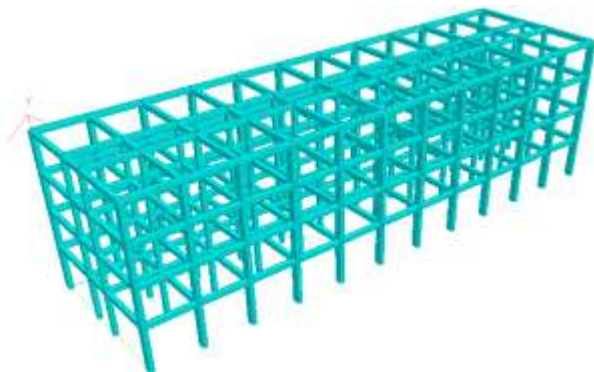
3D rendering view of the structure in STAAD.Pro software
